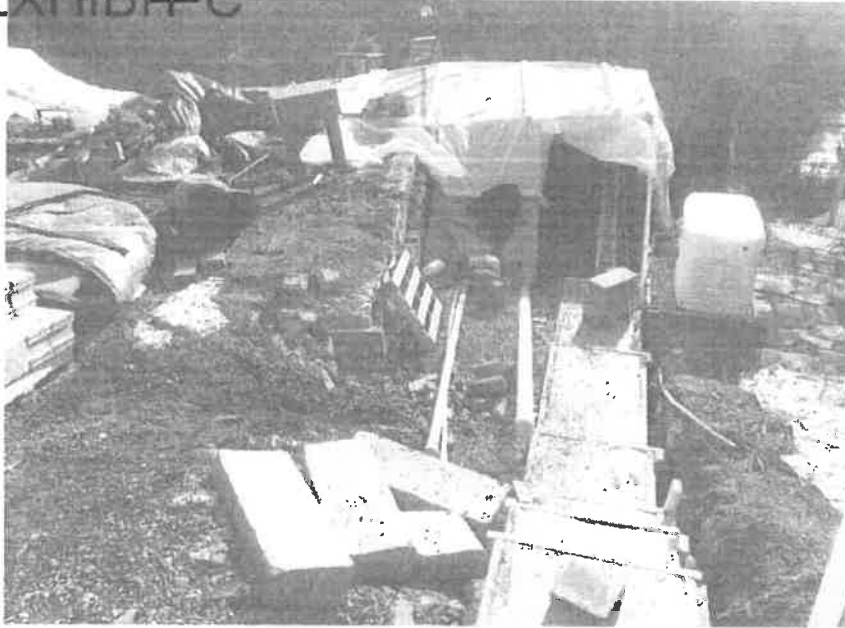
(by others) – Appears to be view looking south (generator on right, drain pipe on left) at stepped footing higher up the hill. Note CMU inside covered area beyond. An enlargement of this photo inside the cover is below (see Photo 14).
